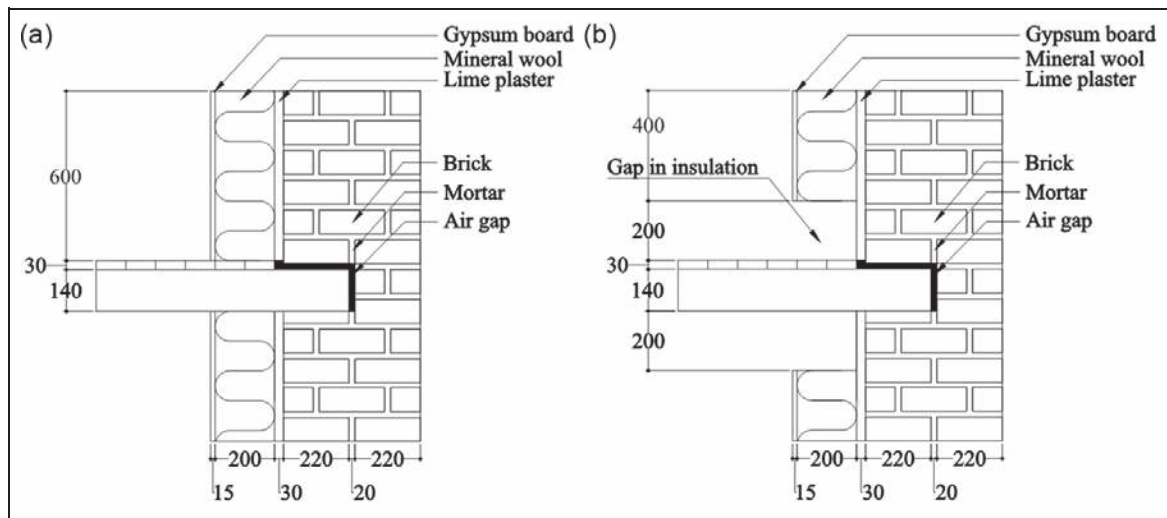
Detailed description of the beam end and wall joint. Between the gypsum board and mineral wool, the vapour barrier was placed. (a) The measure without a gap and (b) the applied insulation with a gap.
